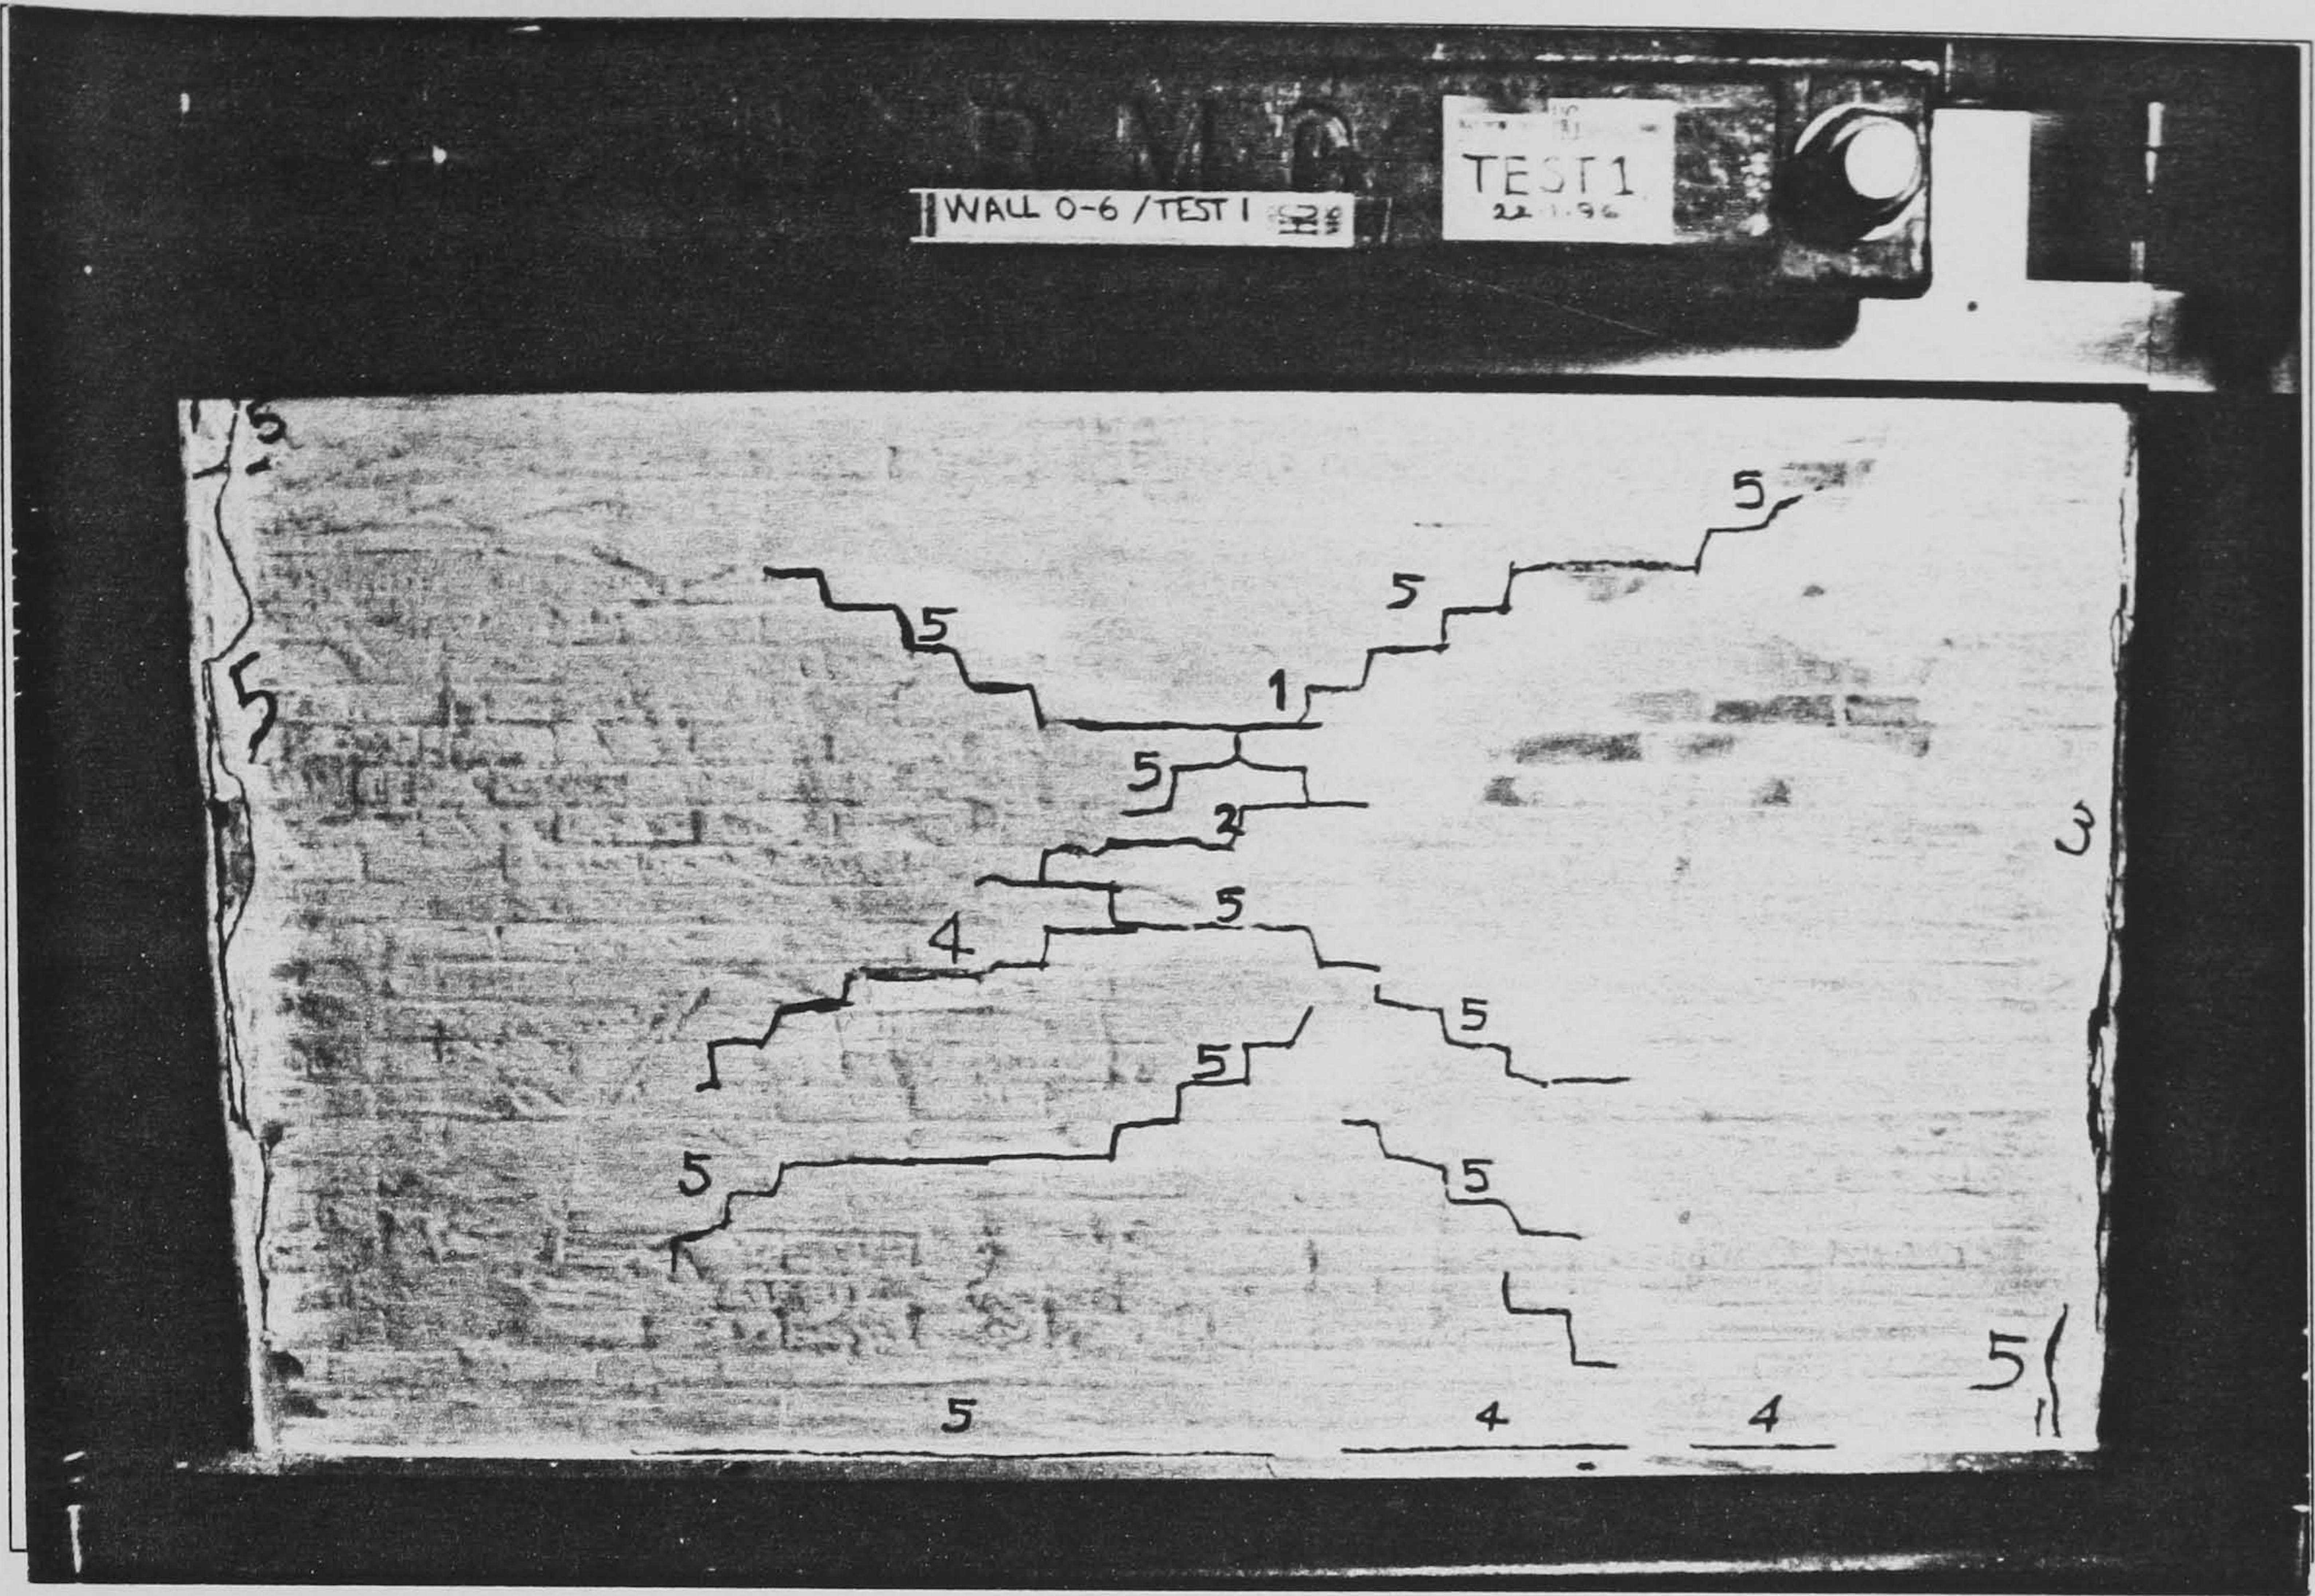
Cracking at 1.08g ground acceleration (wall-O)
